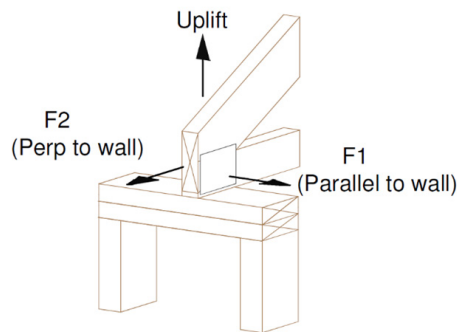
UPLIFT AND LATERAL LOAD ORIENTATIONS FOR TRUSS, RAFTER, AND JOIST
